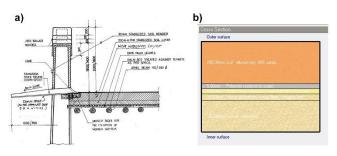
Roof floor layer: a) as built detail, b) design builder data entry roof layer.
